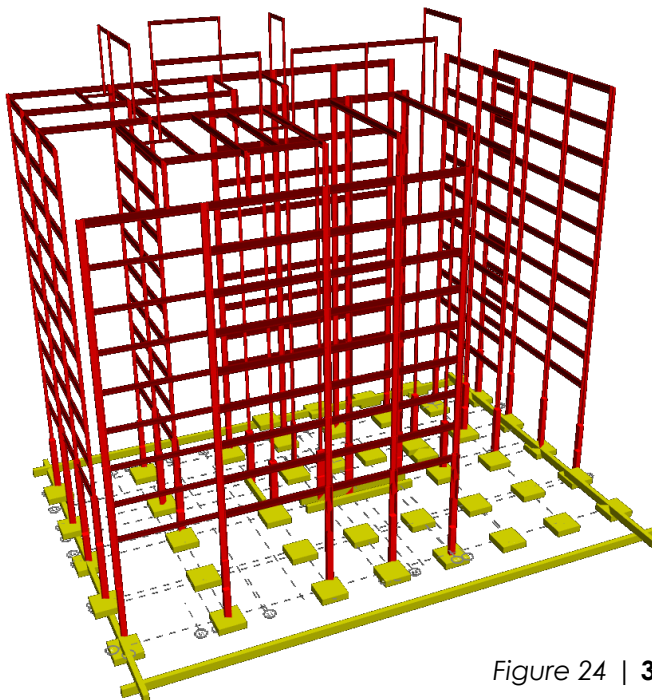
| 3-Dimensional View Of Moment Frame Layout
